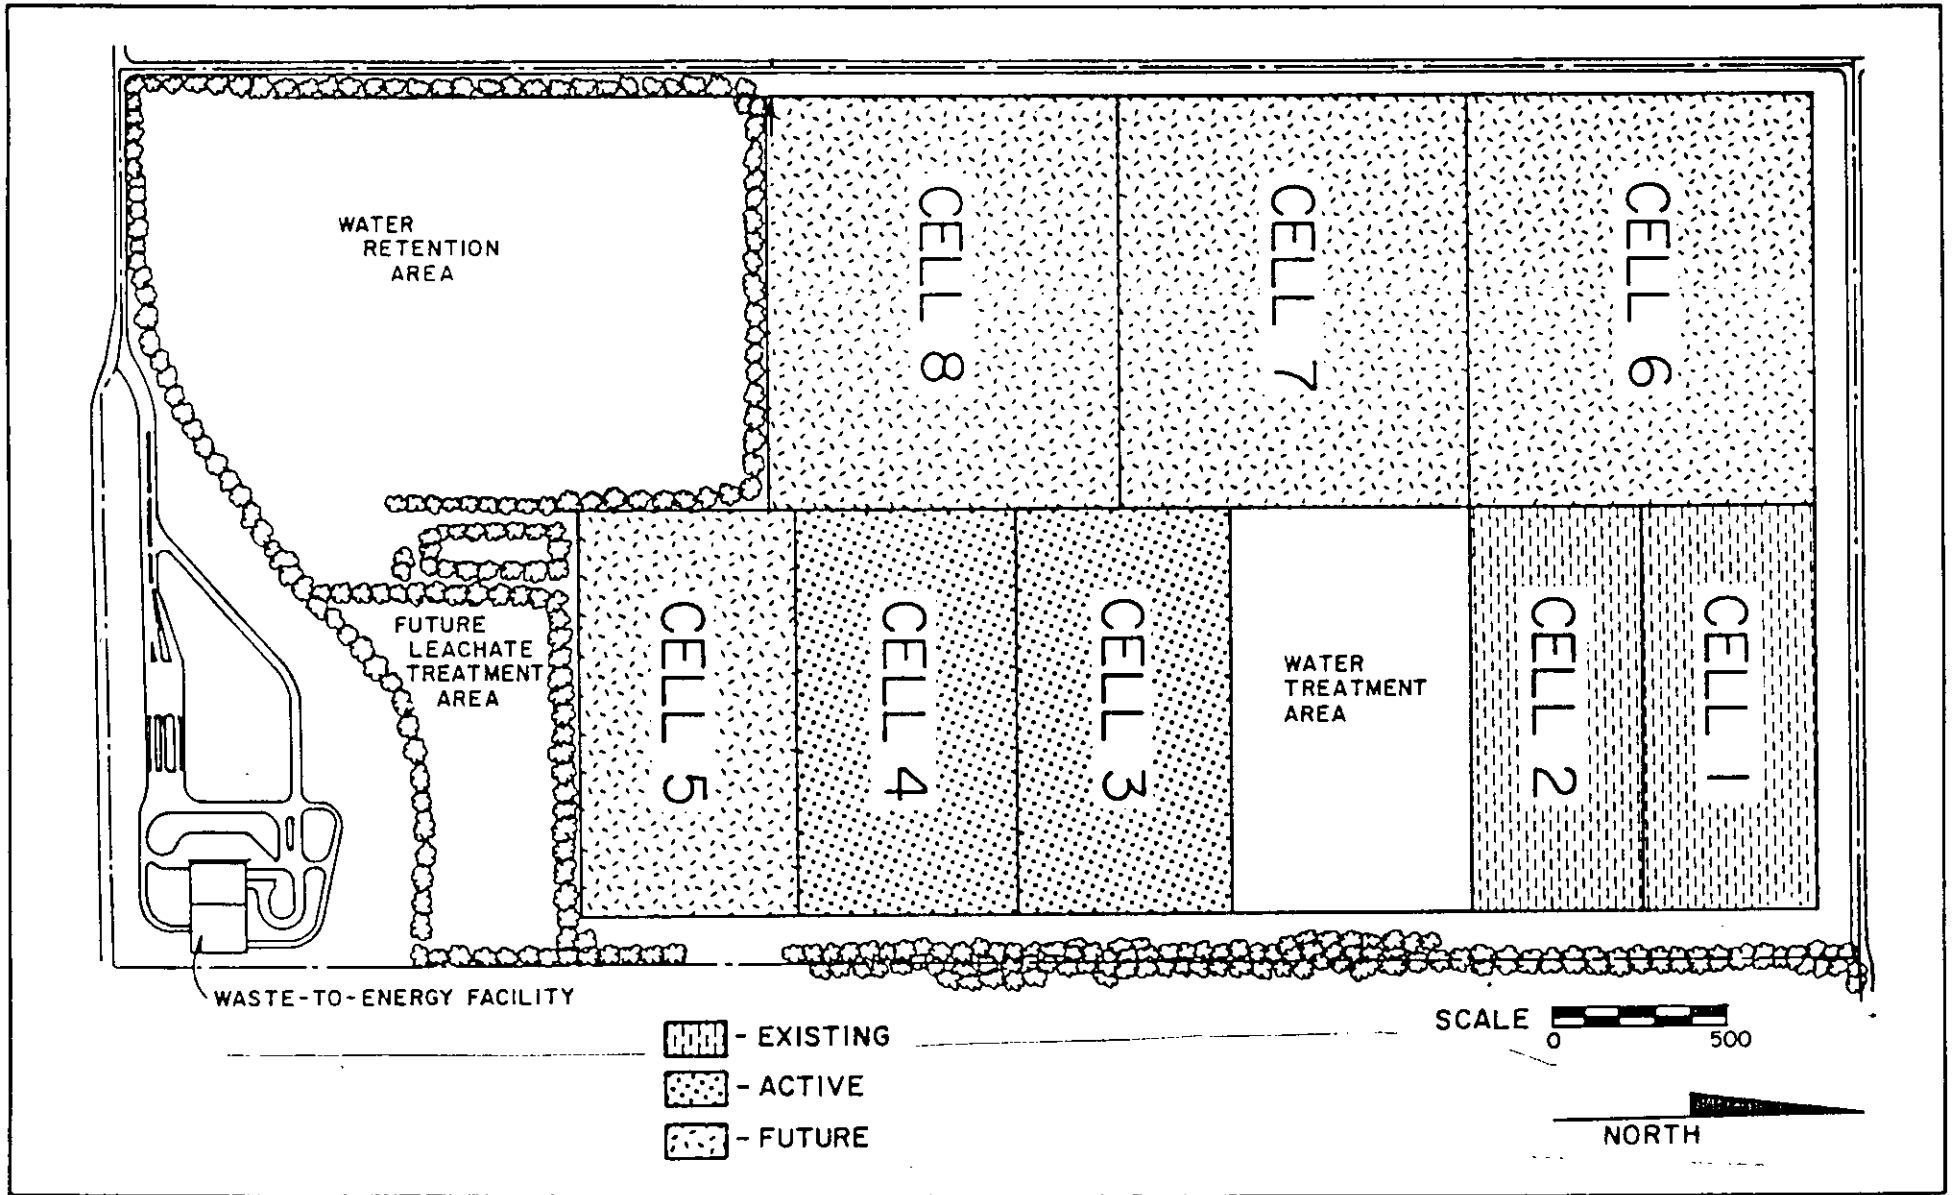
NAPLES SANITARY LANDFILL SITE PLAN
